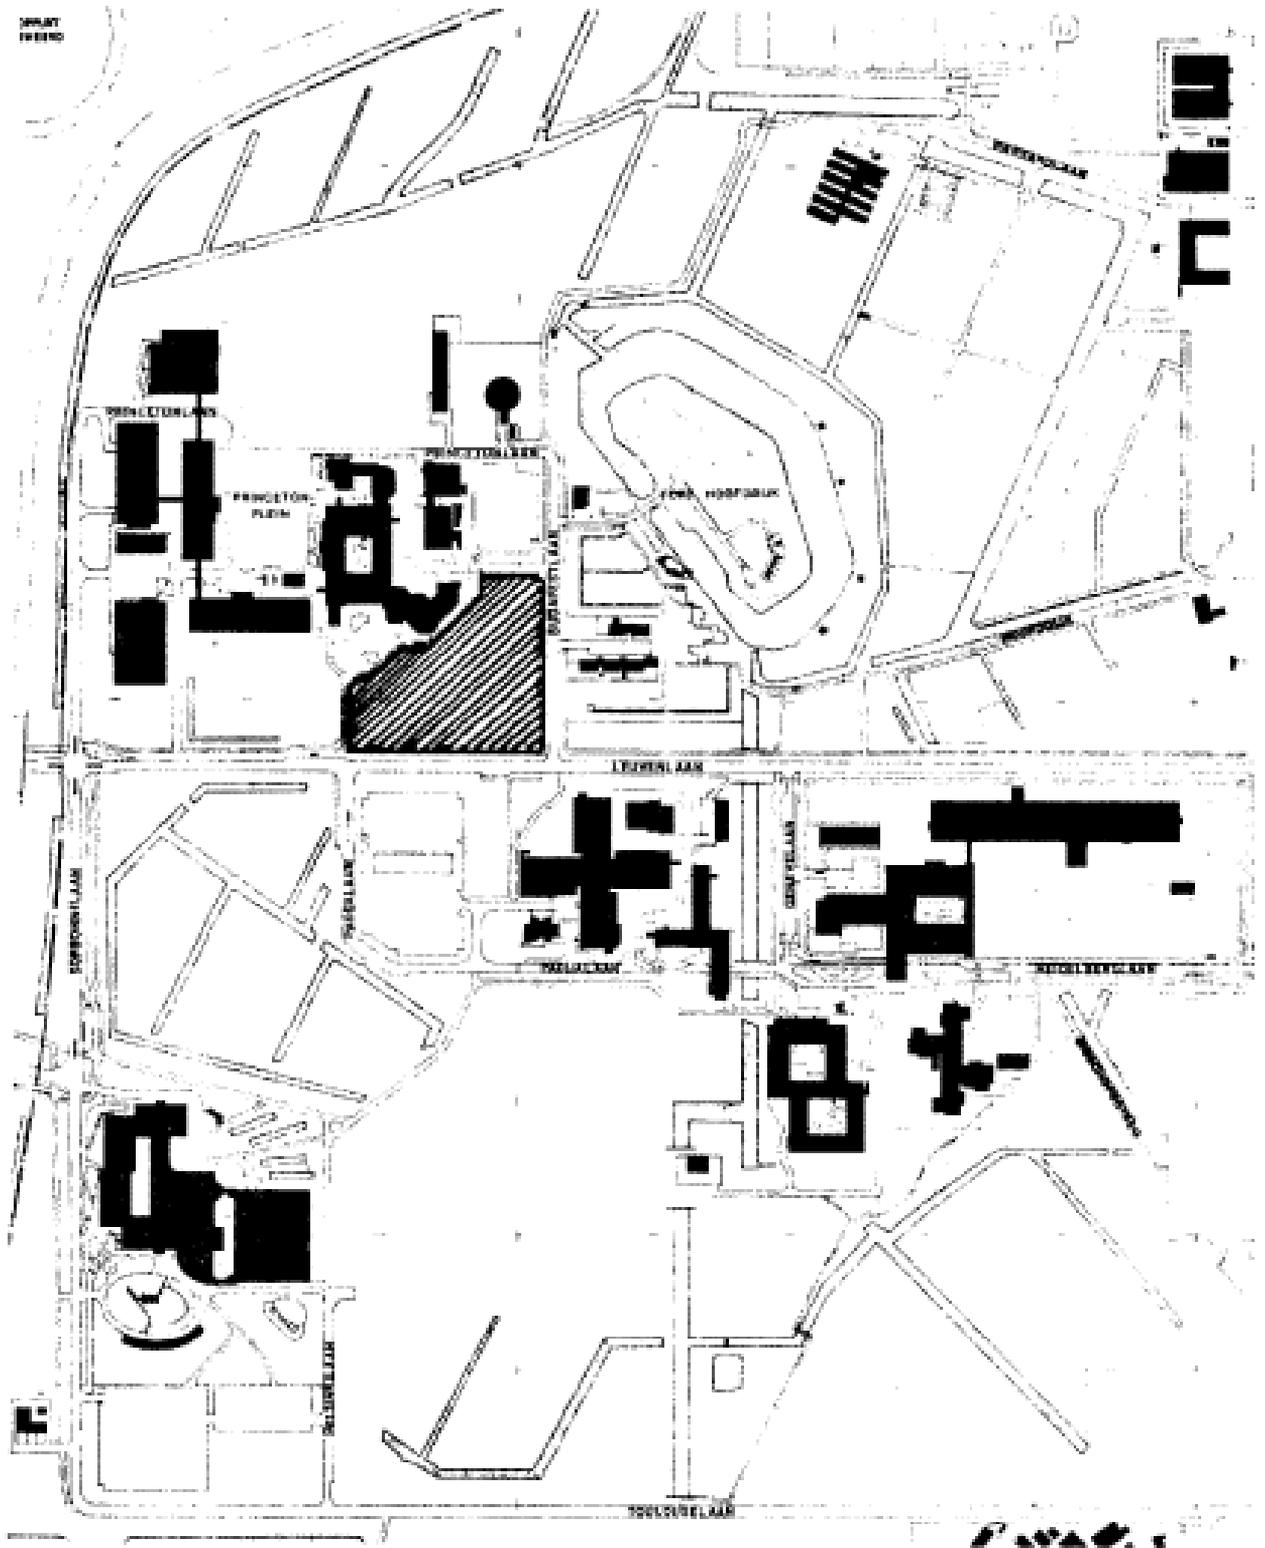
Plan of the university campus in Utrecht and the site of the new building.
